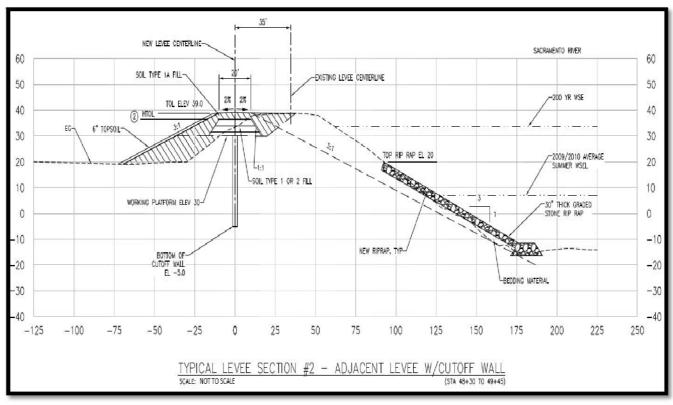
Typical Cross Section – Adjacent Levee with Cutoff Wall
